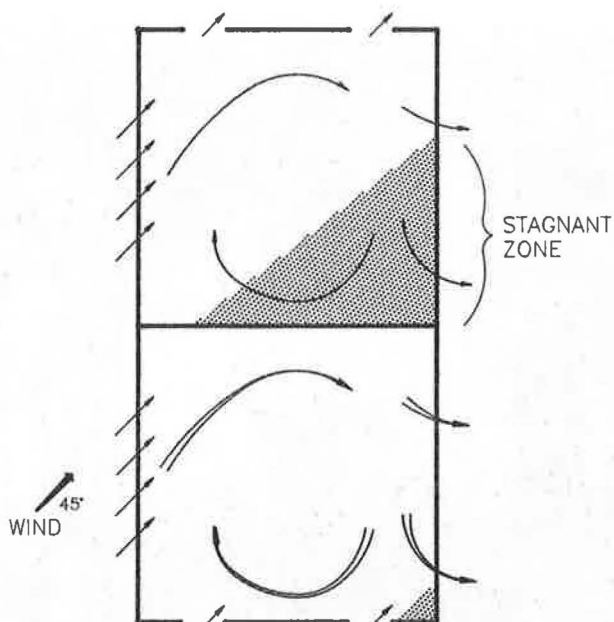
In a multi-room building, the upwind room has a slightly higher ventilation rate.
